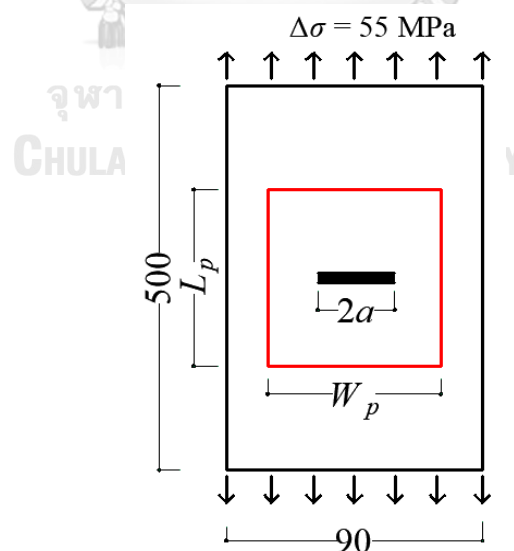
Cracked steel plate in the design example (dimension in mm).
